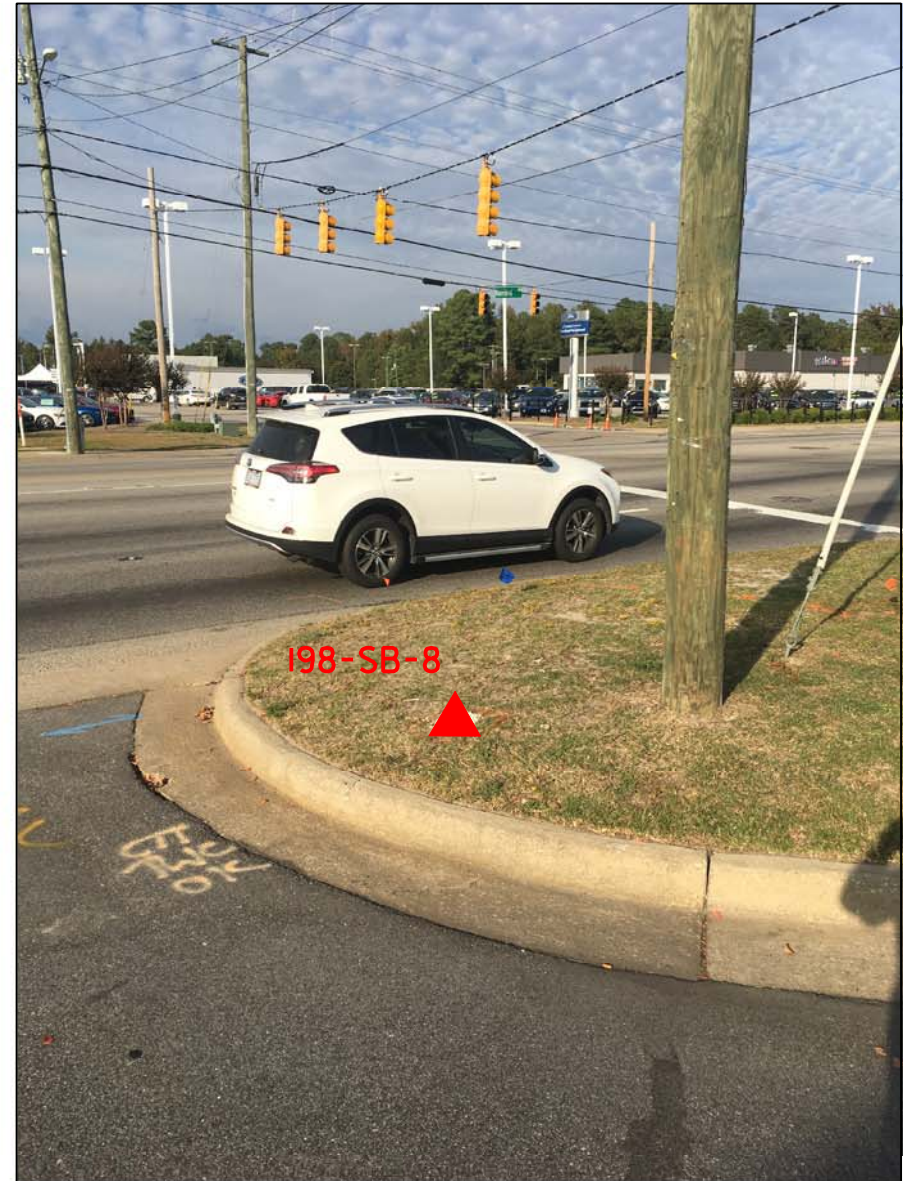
VIEW OF SOIL BORING LOOKING NORTH
